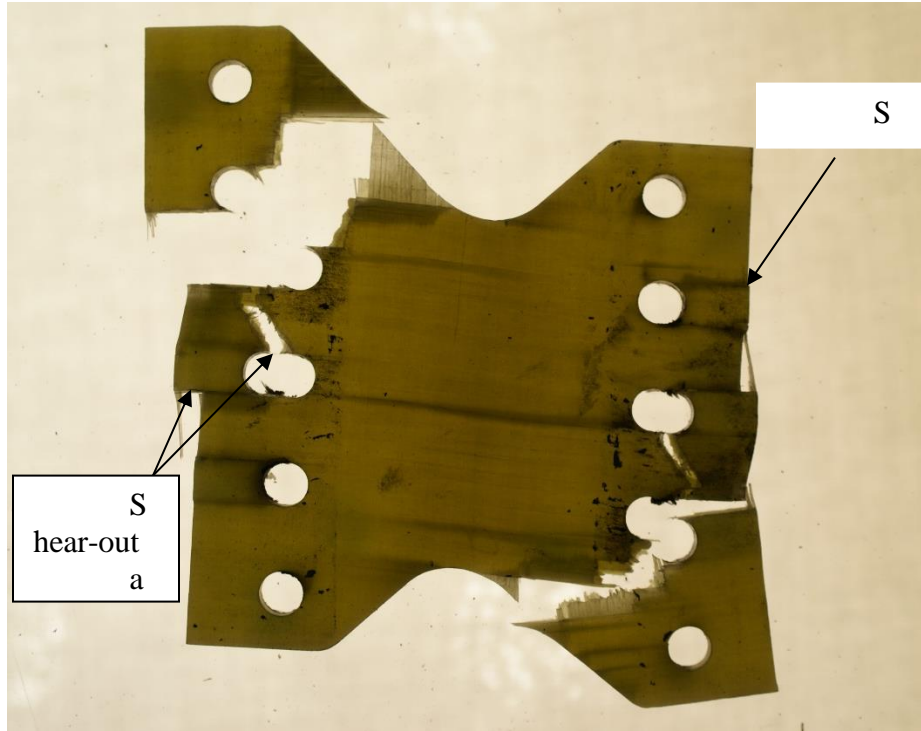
Bolt-hole failures in specimen SM6--1-2, tested at 45° loading angle.
